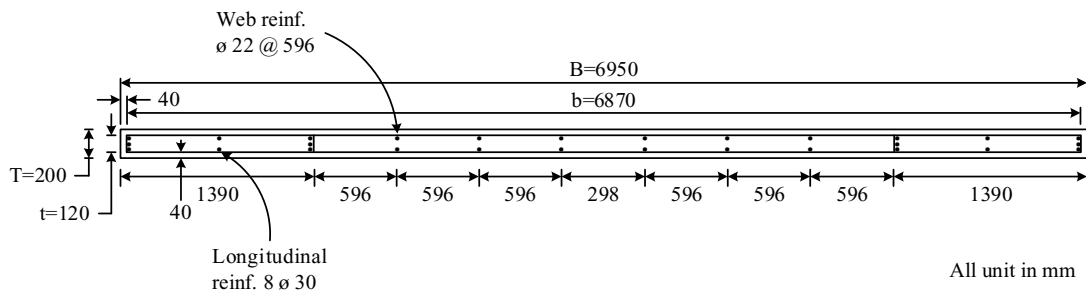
Reinforcement details and cross-section for walls 3, 4 and 5 (Masjuki, 2017)
